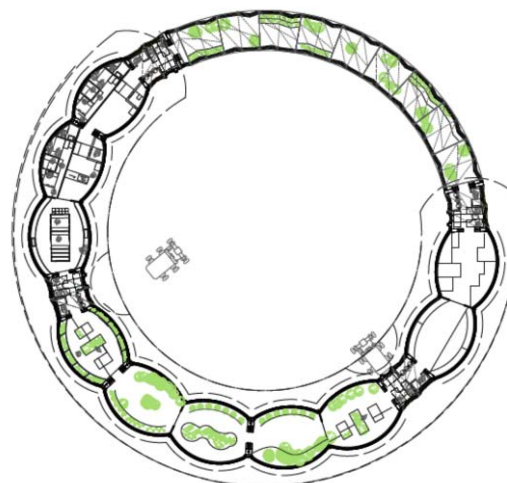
Plan of the final layout. (credit: HB2, TU Wien, Design Studio Moon Village, Garber, Lehr-Splawinski, 2018)
